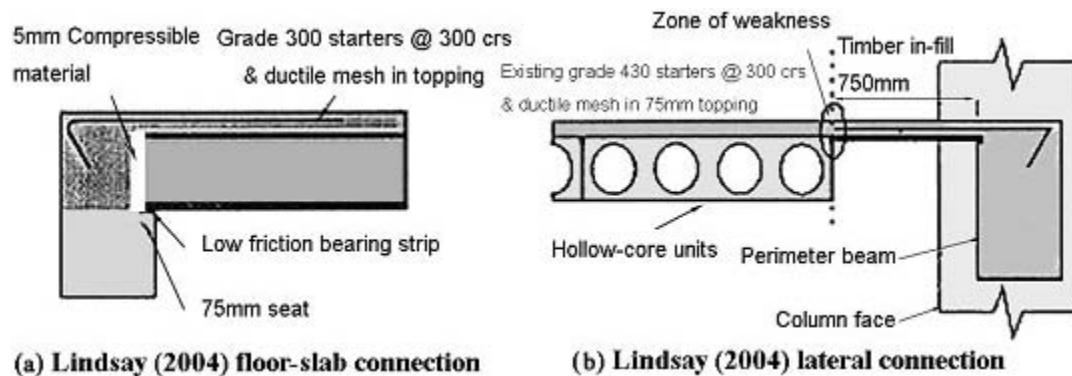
(a) End connection details (b) lateral beam-to-hollowcore connection from Lindsay [2004]
